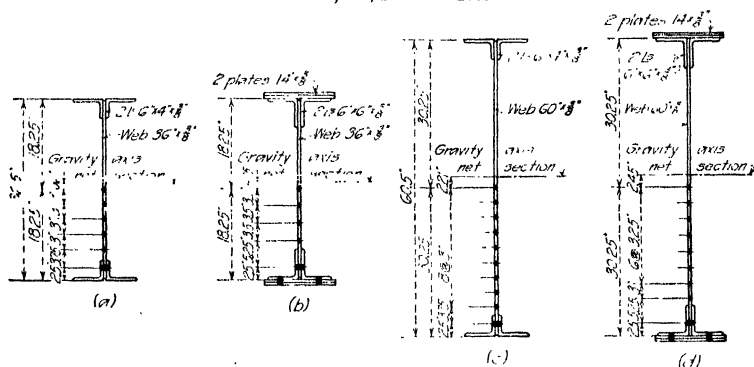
Comparison of the section moduli of typical plate girder sections.
